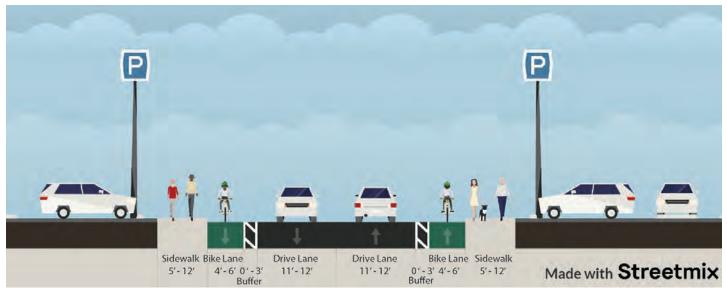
Suburban Commercial Center Cross Section Ranges with Onstreet Bike Lanes
